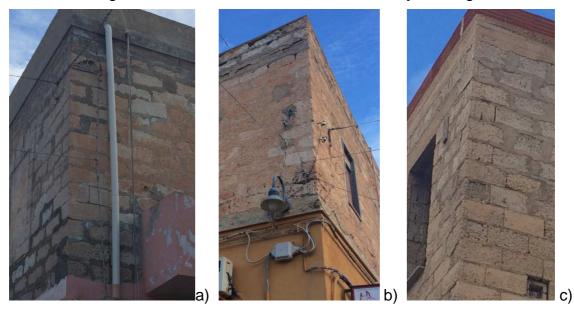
Effectiveness of corner clumping of buildings. a-b) Limestone masonry; c) Concrete block masonry.
